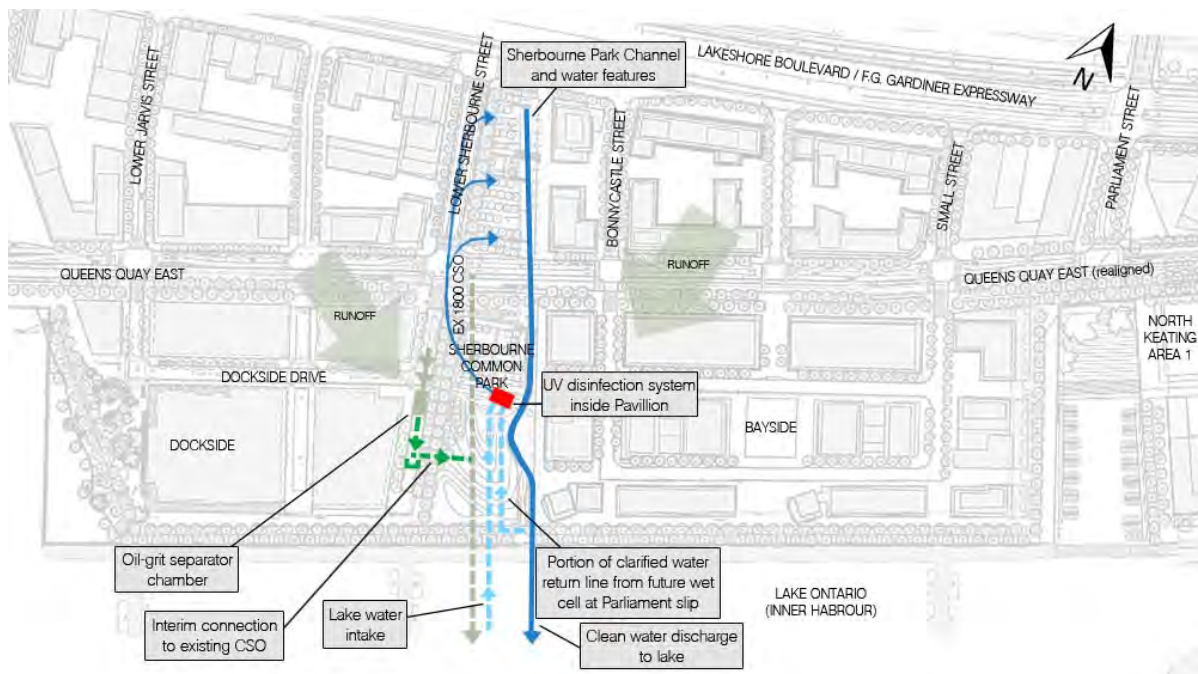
Existing Stormwater Quality Components Installed at EBF as of 2012
